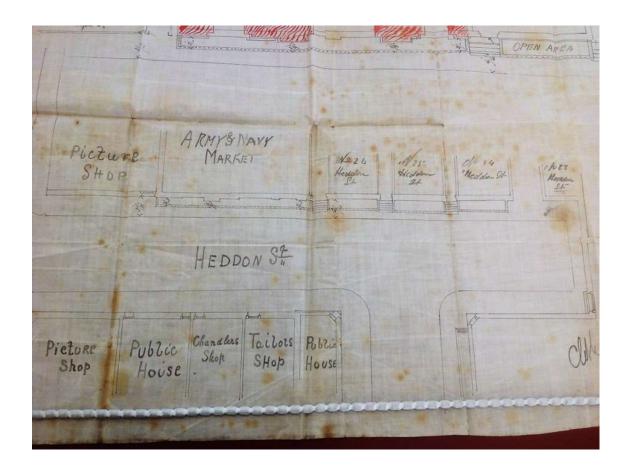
BLOCK DESIGN PLAN OF 121 REGENT STREET SHOWING HEDDON STREET ENTRANCE, 1879. WESTMINSTER CITY ARCHIVES.
